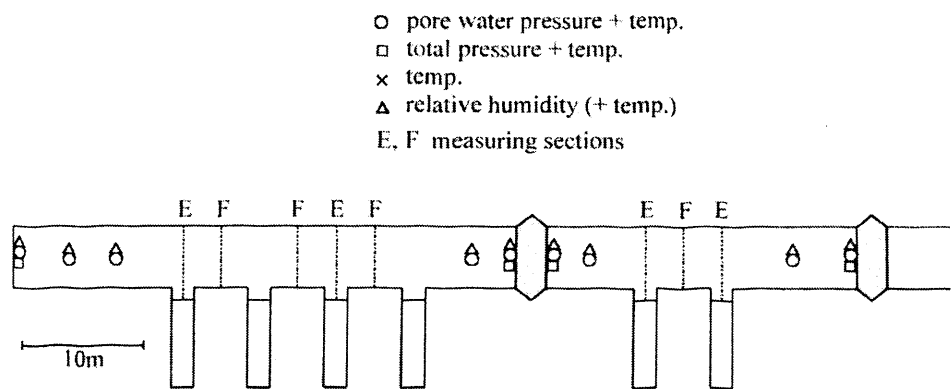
Backfill sensor locations, tunnel long section (Goudarzi and Johannesson, 2007).
